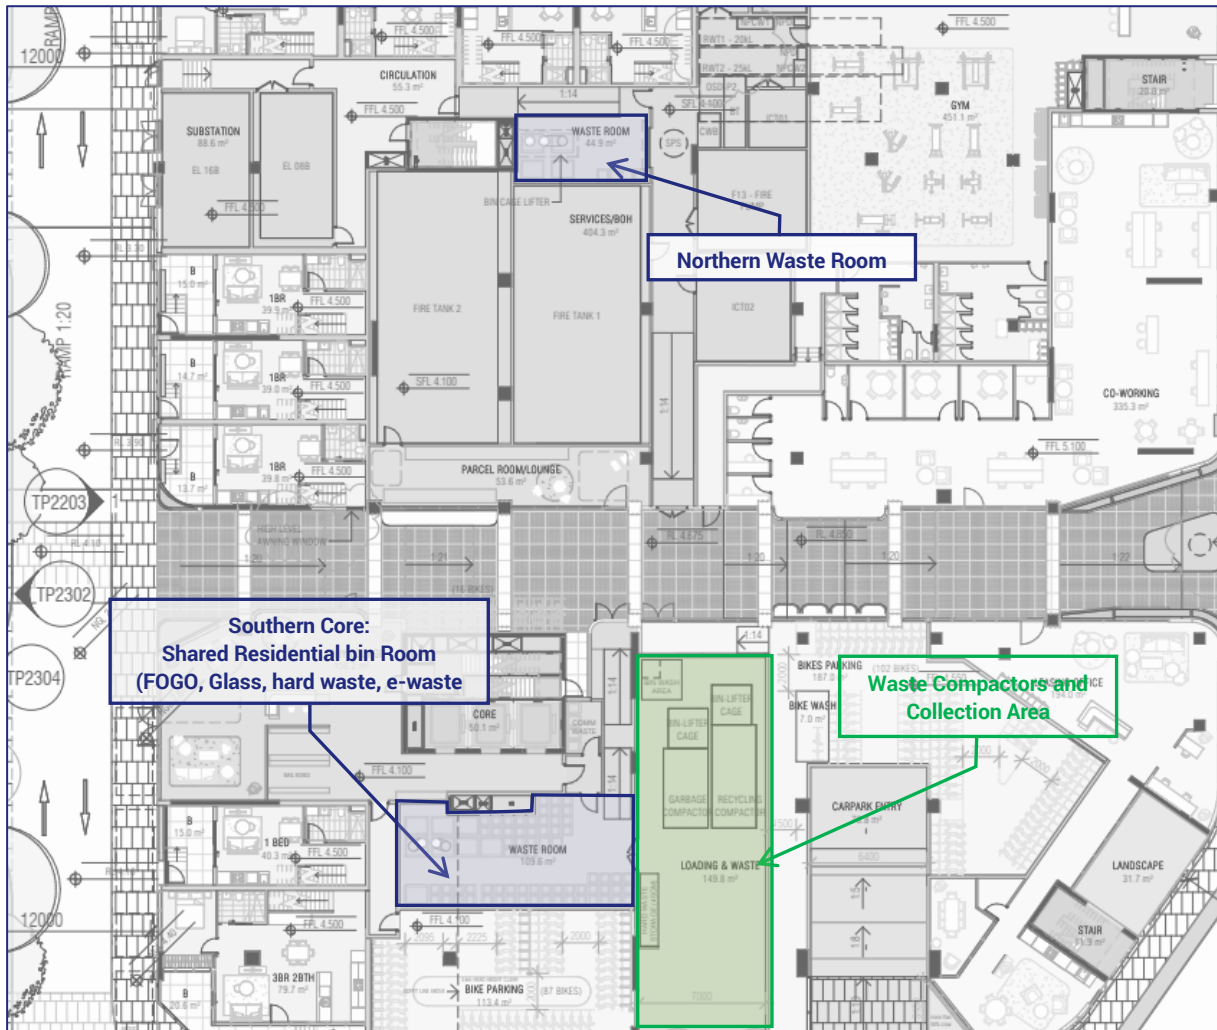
Waste Rooms and Waste Collection Point for Stage 2
